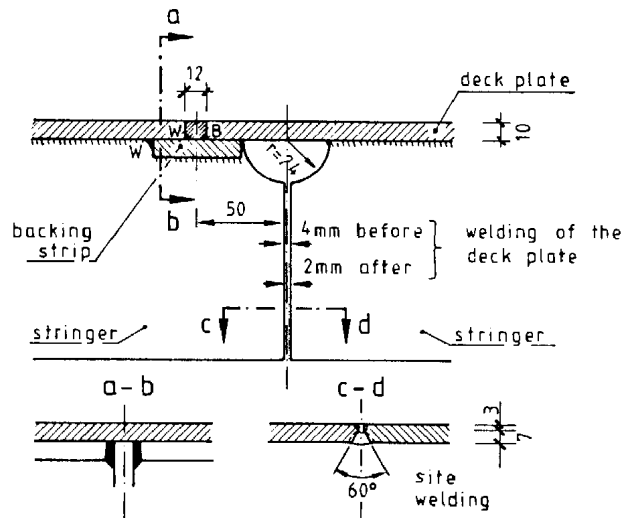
Detailing of the welded joints, [MAN, 1957].
